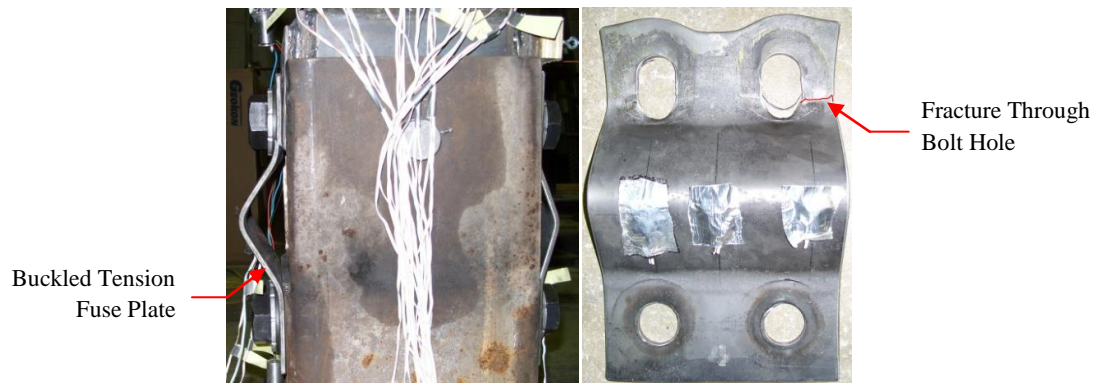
Post-test buckled structural fuse plates with fracture of tension fuse plate highlighted
